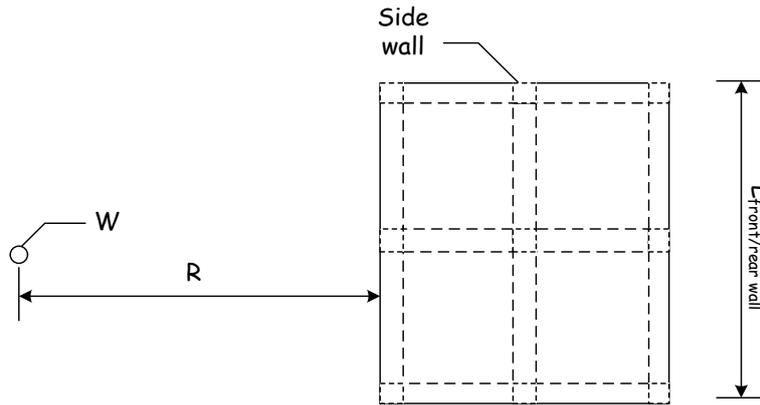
Model Structure Subjected to Blast Action (plan)
